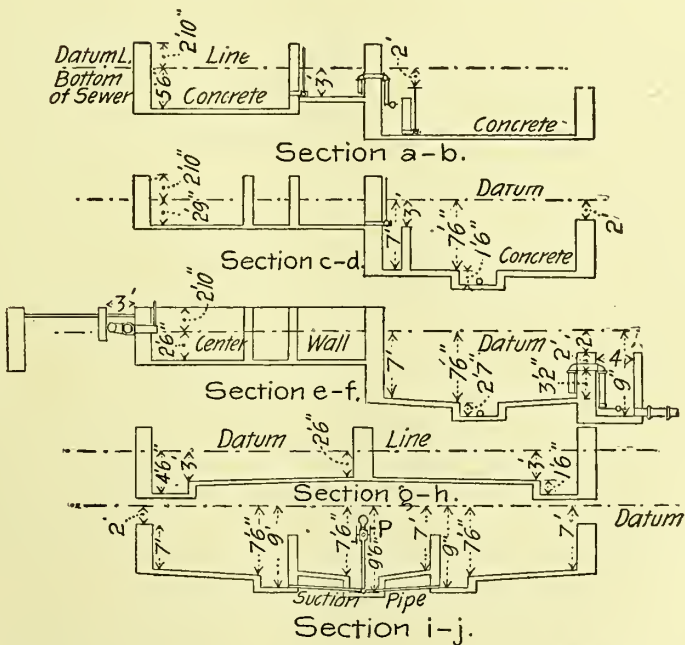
VERTICAL SECTIONS SEWAGE PURIFICATION WORKS AT
